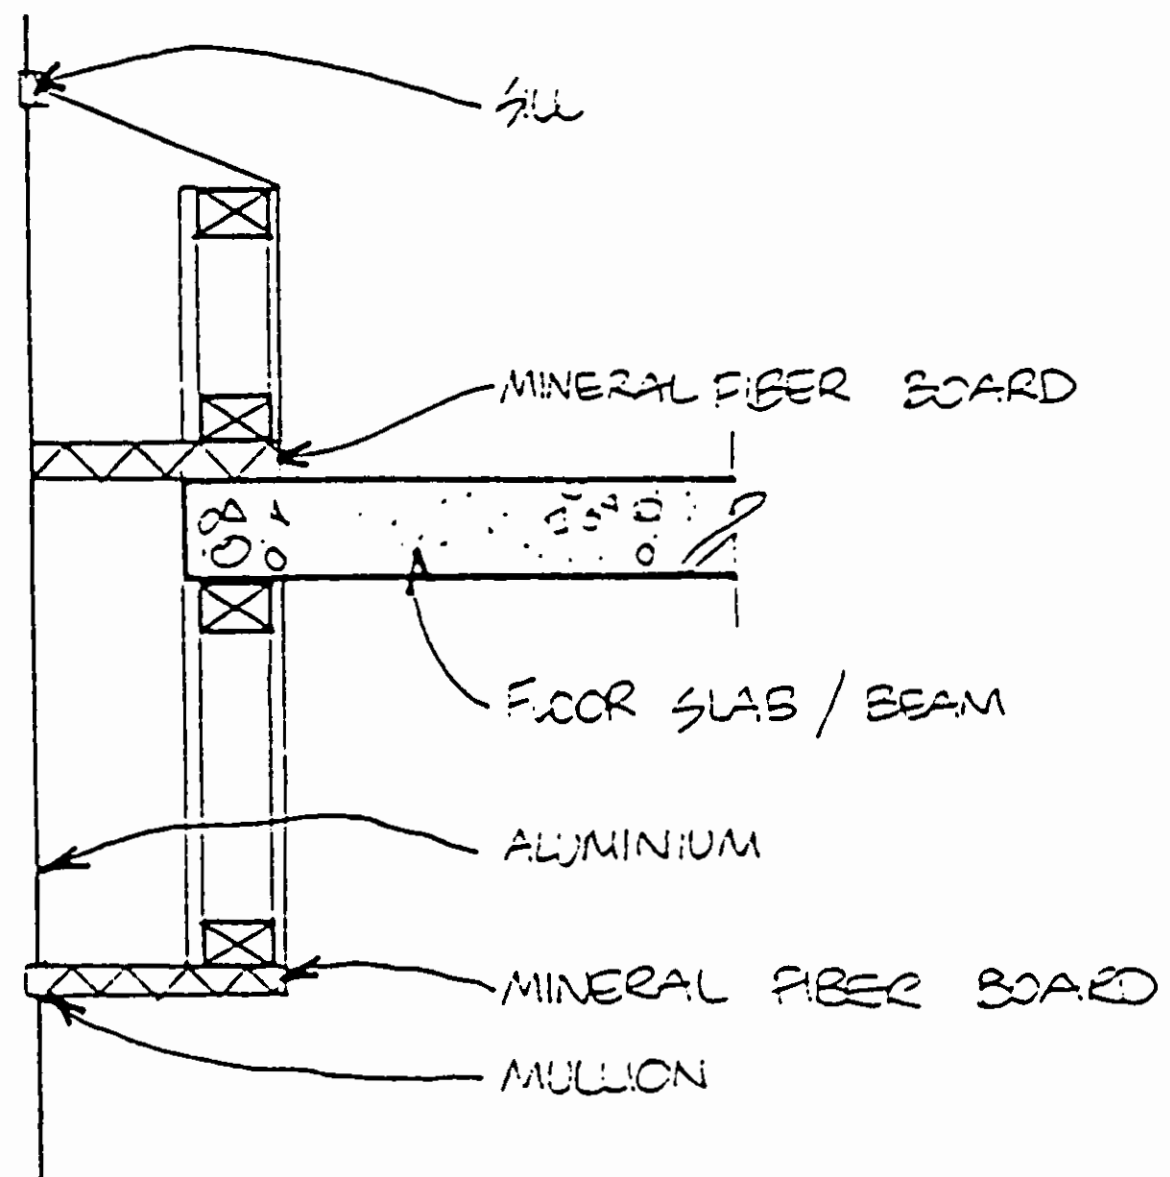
(b): SECTION THROUGH CONCRETE FRAMED, ALUMINIUM AND GLASS CURTAIN WALL BUILDING
